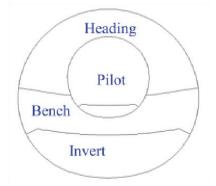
(a) Tunnel Geometry in 2D Plane Strain
